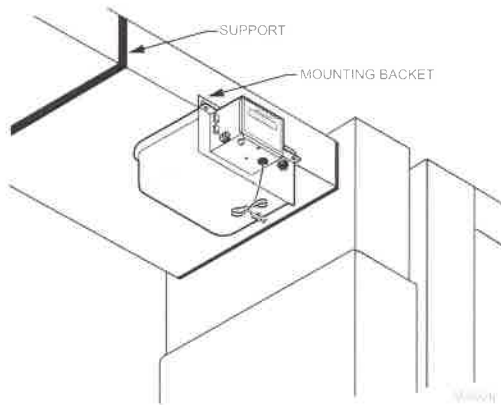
Mounting humidifier horizontally under duct using mounting bracket.
